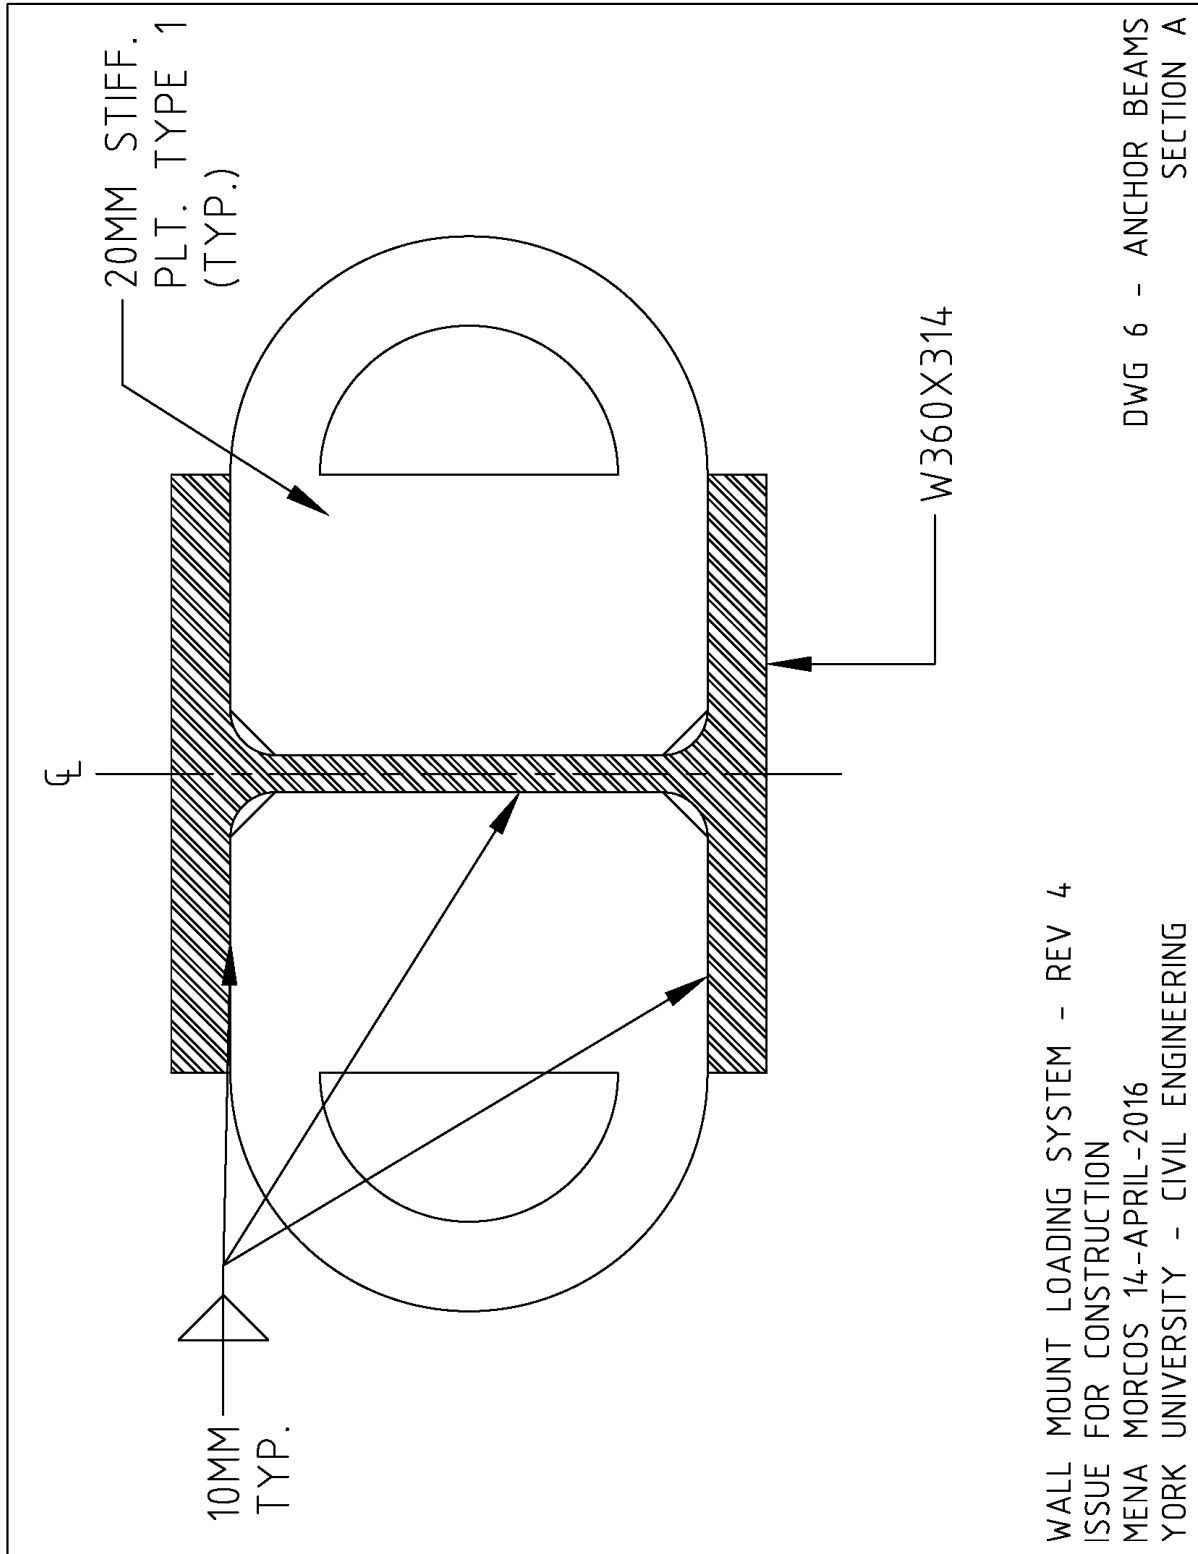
Wall mount loading system design and fabrication drawing – Drawing 6.
